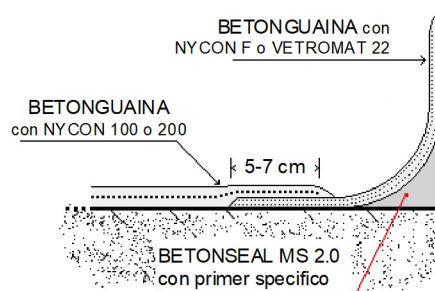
Waterproofing of vertical overlaps and flat surfaces.
